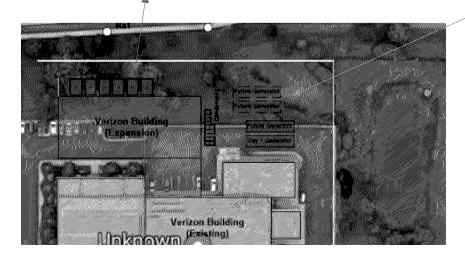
Partial plan view showing the layout and location of the proposed barrier wall.
